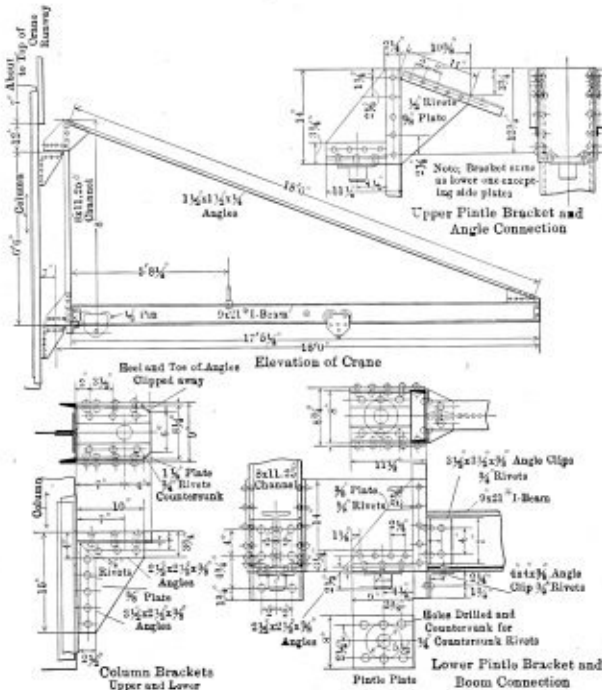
PORTABLE JIB CRANE TO BE USED IN THE BOILER SHOP.
